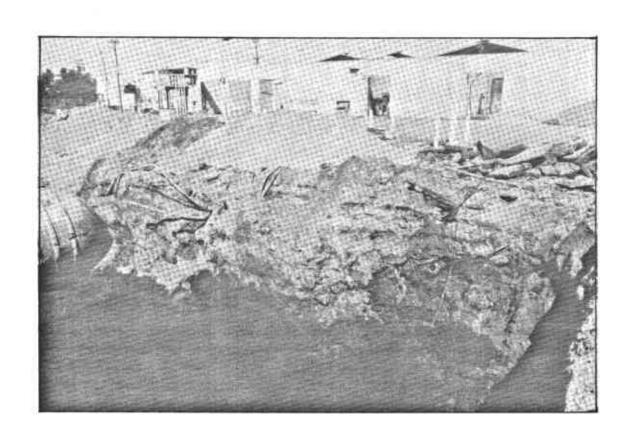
BAY CENTER FILL STRATA IN EXCAVATED TANK PITS, NE QUADRANT
